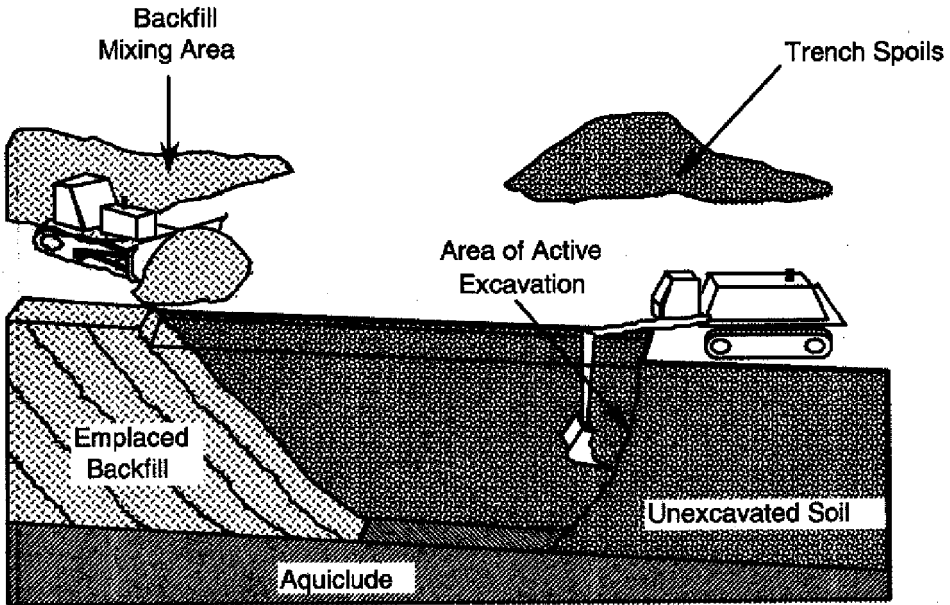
Diagram of the Construction Process for a Soil-Bentonite Backfilled Slurry Trench Cutoff Wall.
